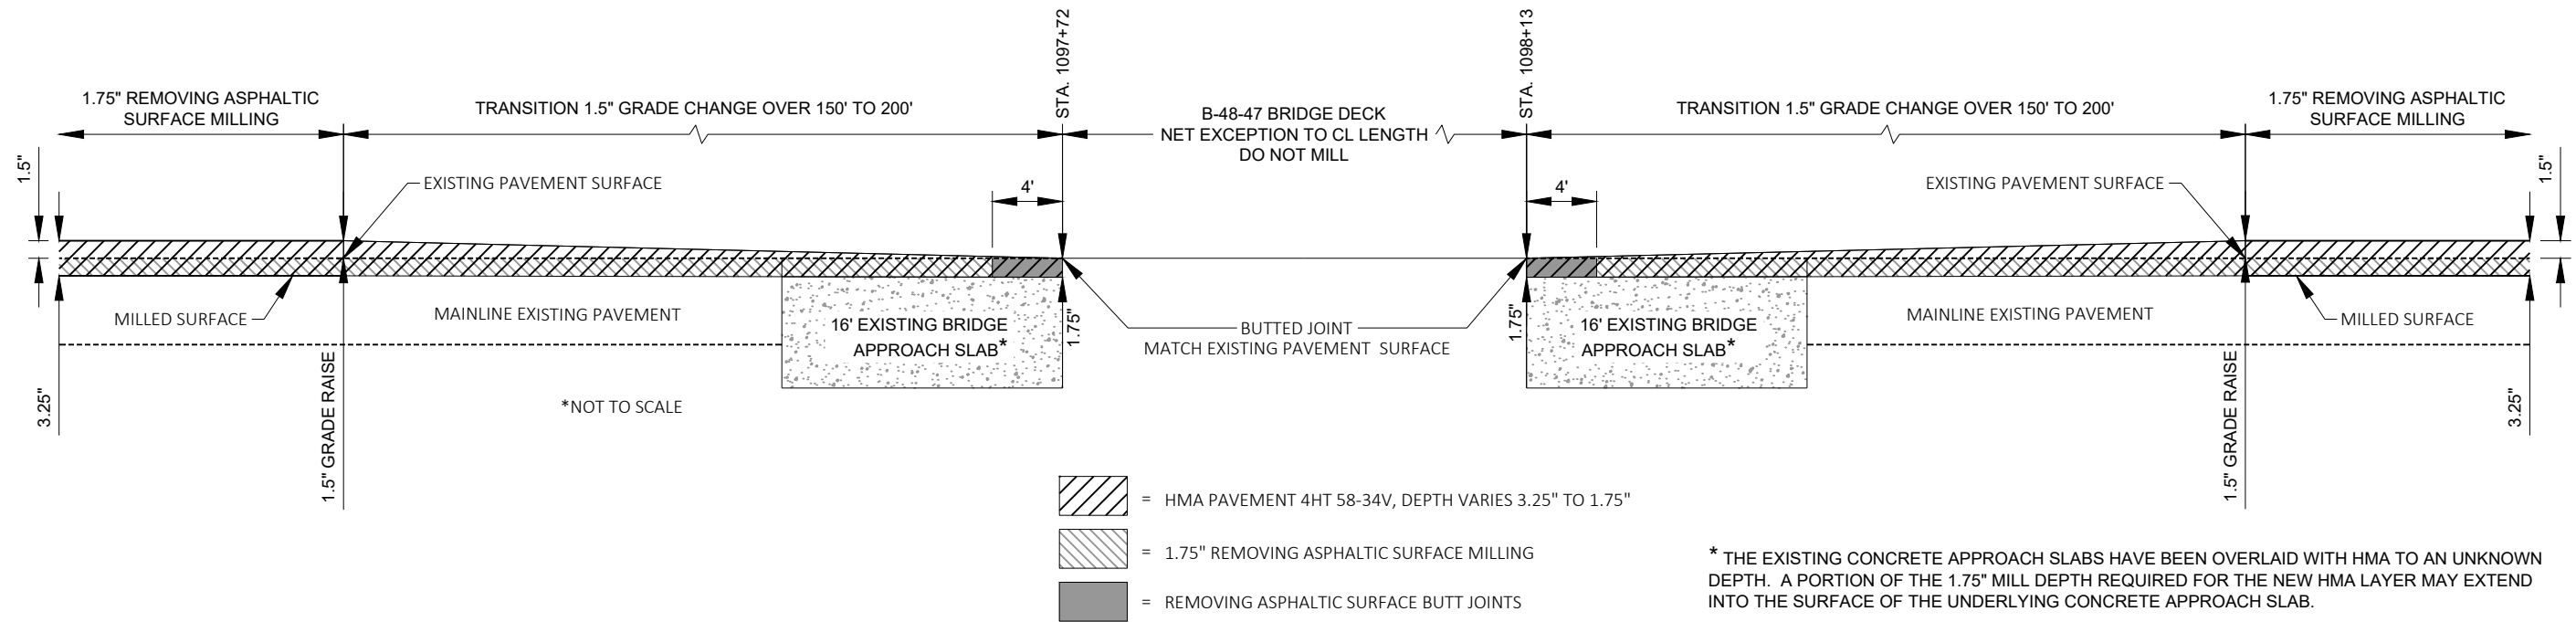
DETAIL OF MAINLINE BUTT JOINT - BEGIN PROJECT (1.5" GRADE RAISE)
